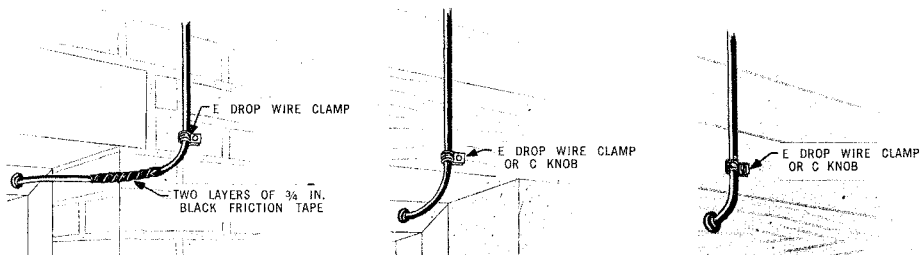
Last Attachment (Building Entrance Hole Slopes Upward from Outside)
